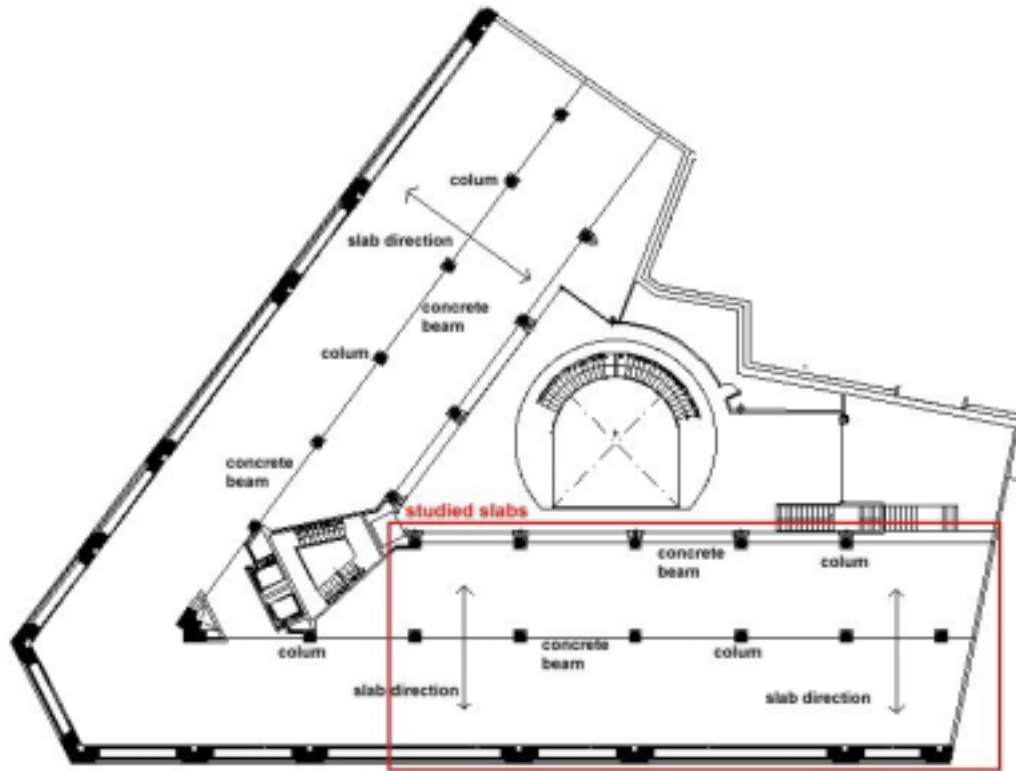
Location of the evaluated slabs in a general plan of the building
